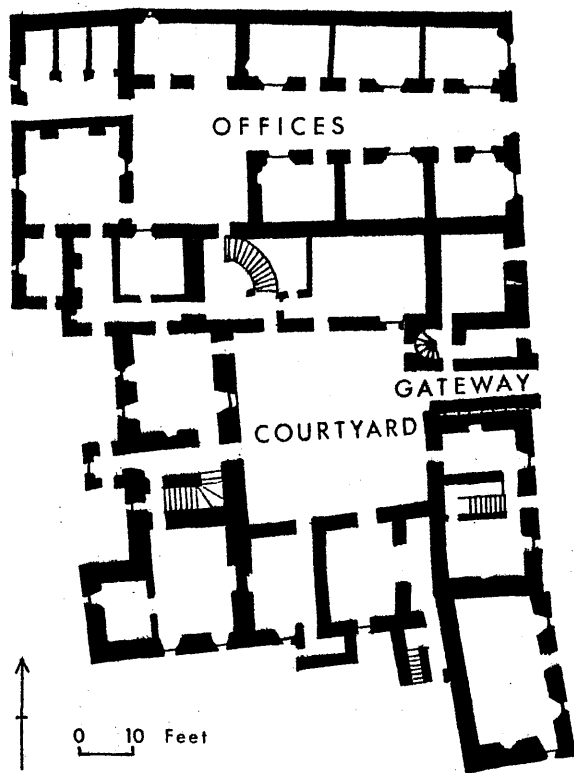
Kirkwall : 72 Victoria Street : house : plan.
